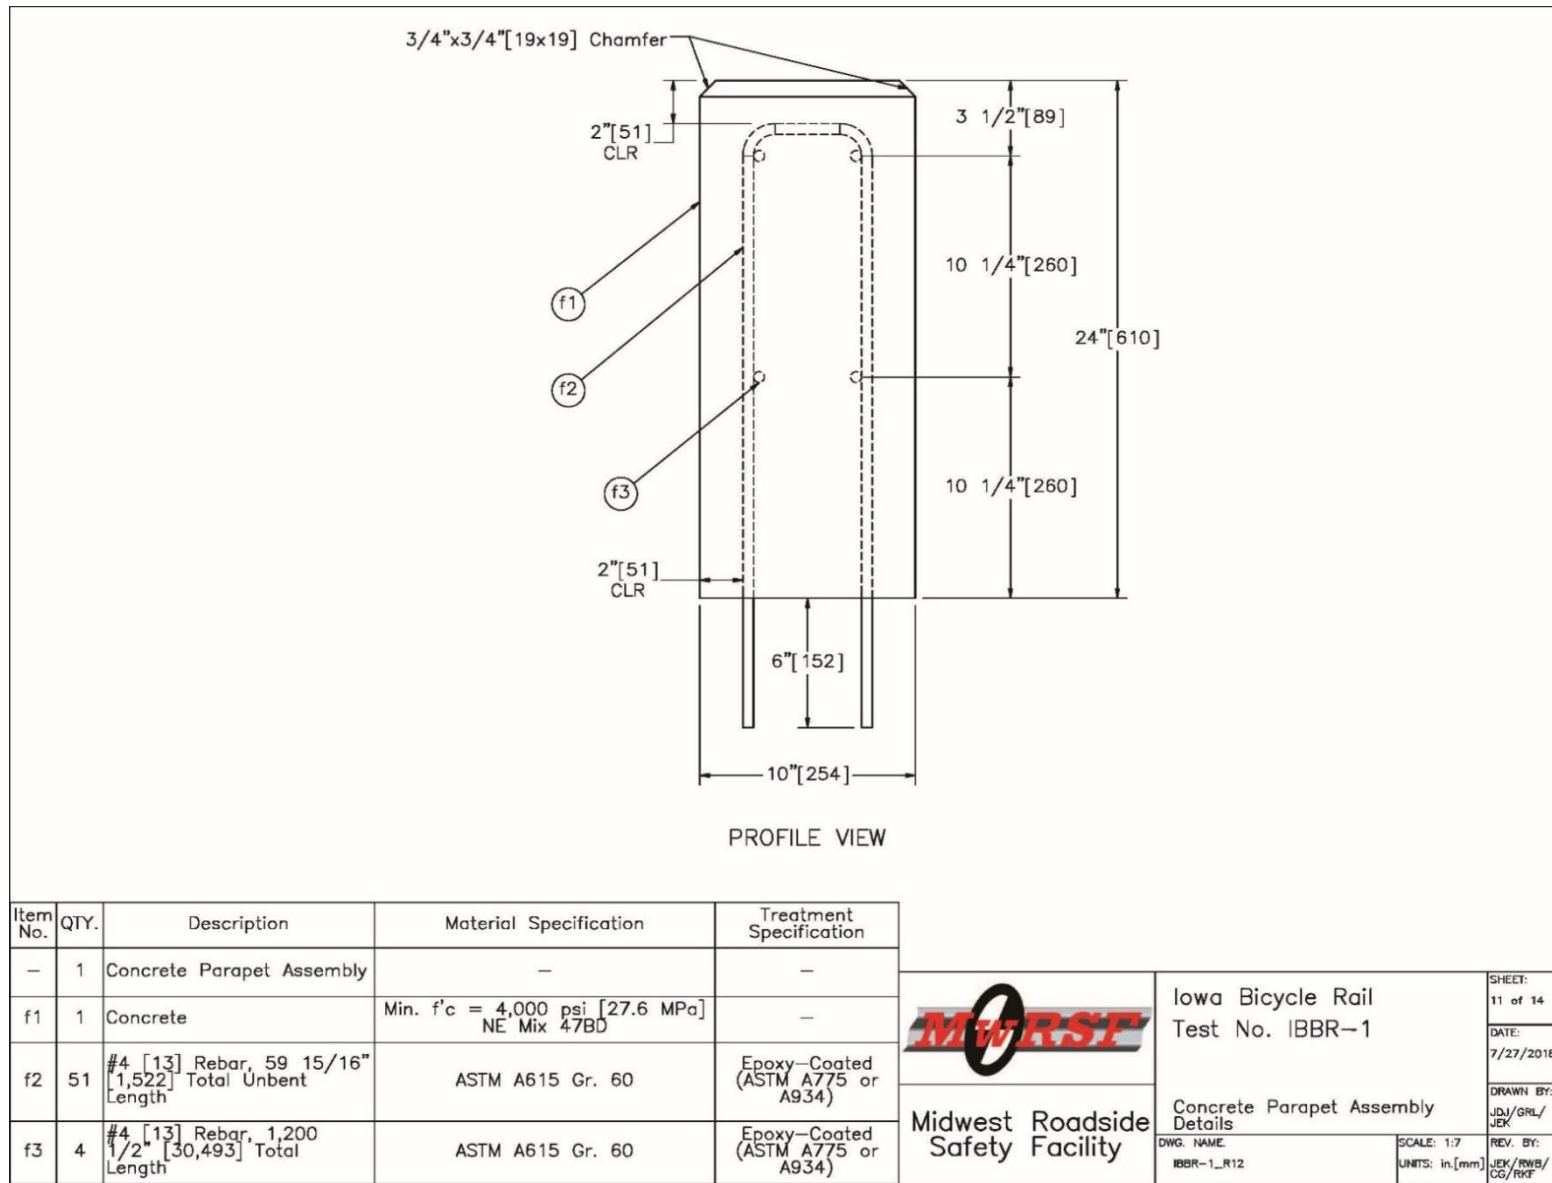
Iowa Bicycle Rail – Concrete Parapet Assembly Details
